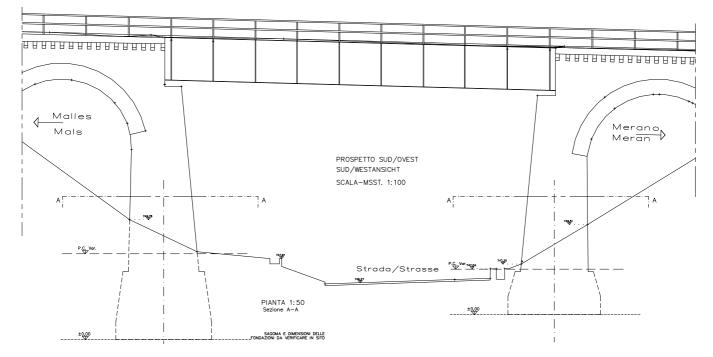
V7 bridge view: masonry arches and steel reticular plank.
